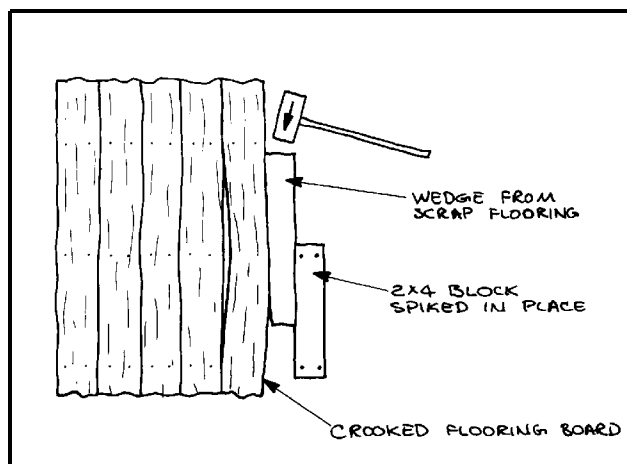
If necessary, you can persuade a warped board into place with a long wedge driven between the flooring and blocking. If a piece is badly crooked, cut into smaller sections.
